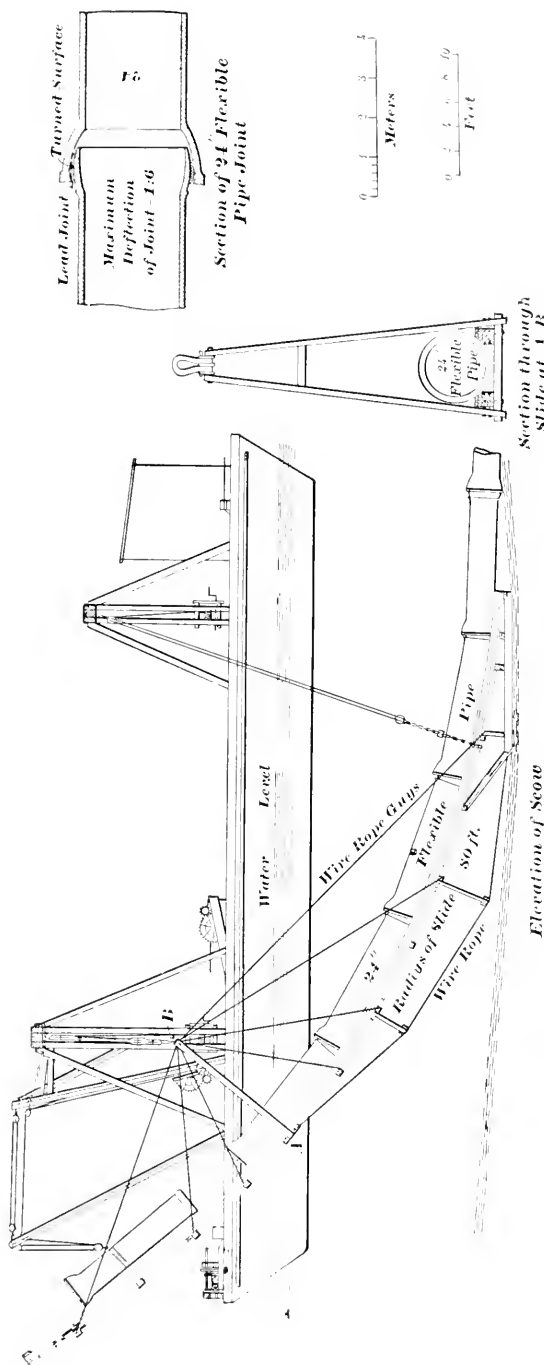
PLATE VII. ELEVATION AND SECTIONS OF PIPE-LAYING SCOW, CHELSEA CREEK, 1900.
